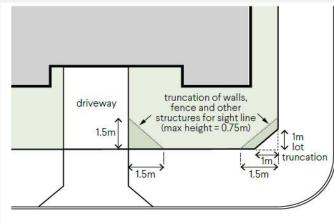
Truncation at street corner to provide sightlines (refer A3.8.7).
